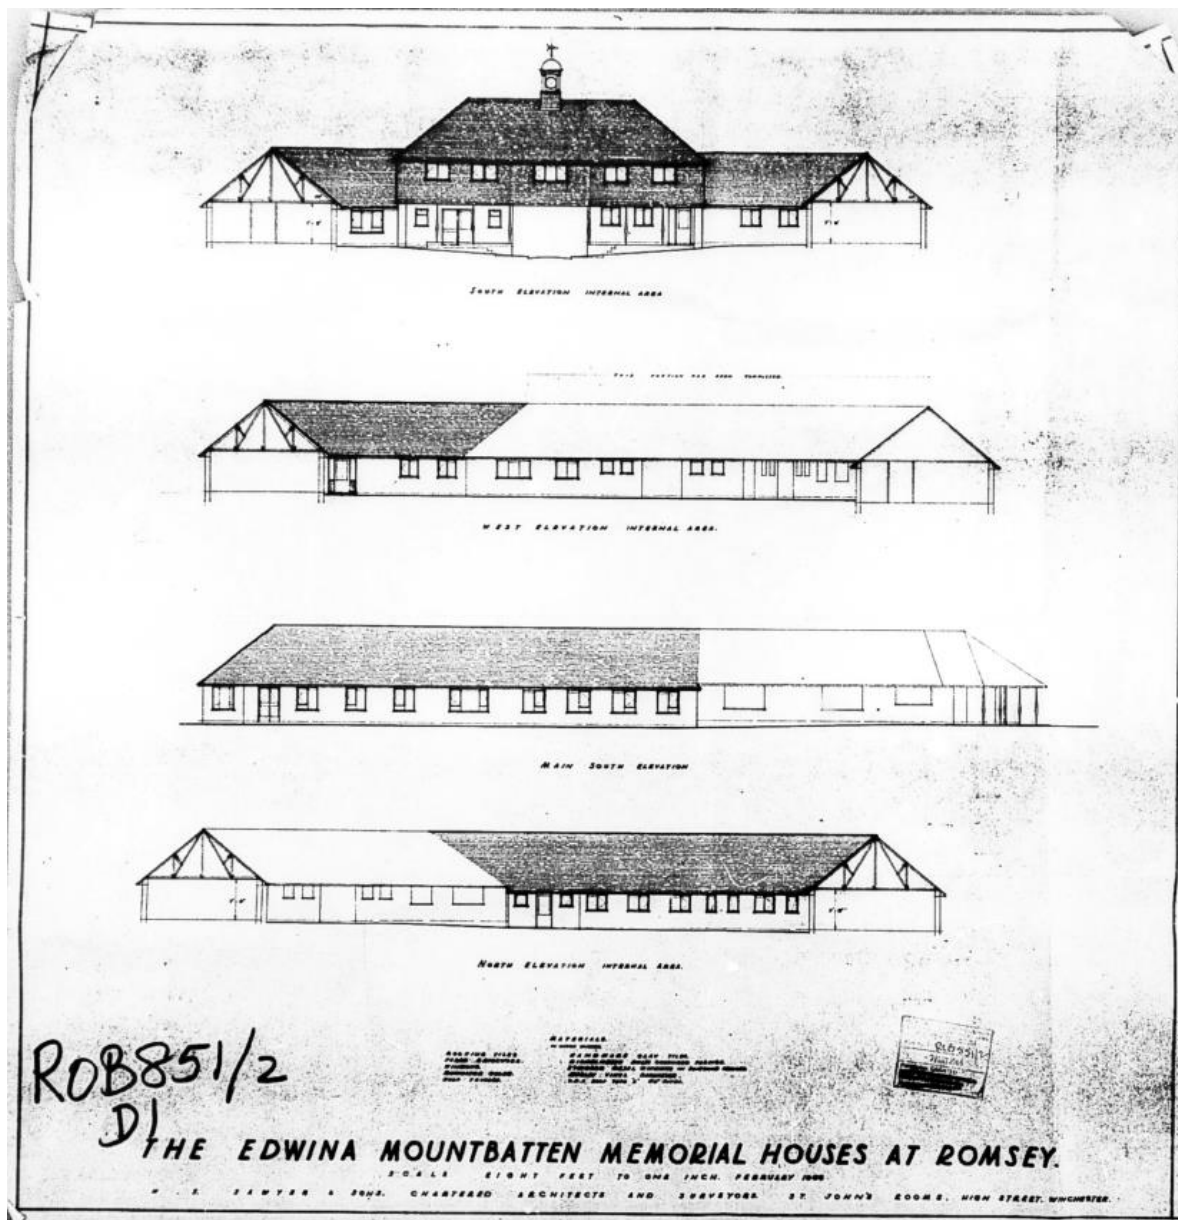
1966 elevations of the extension to Edwina Mountbatten House. The existing building is shown unshaded.
